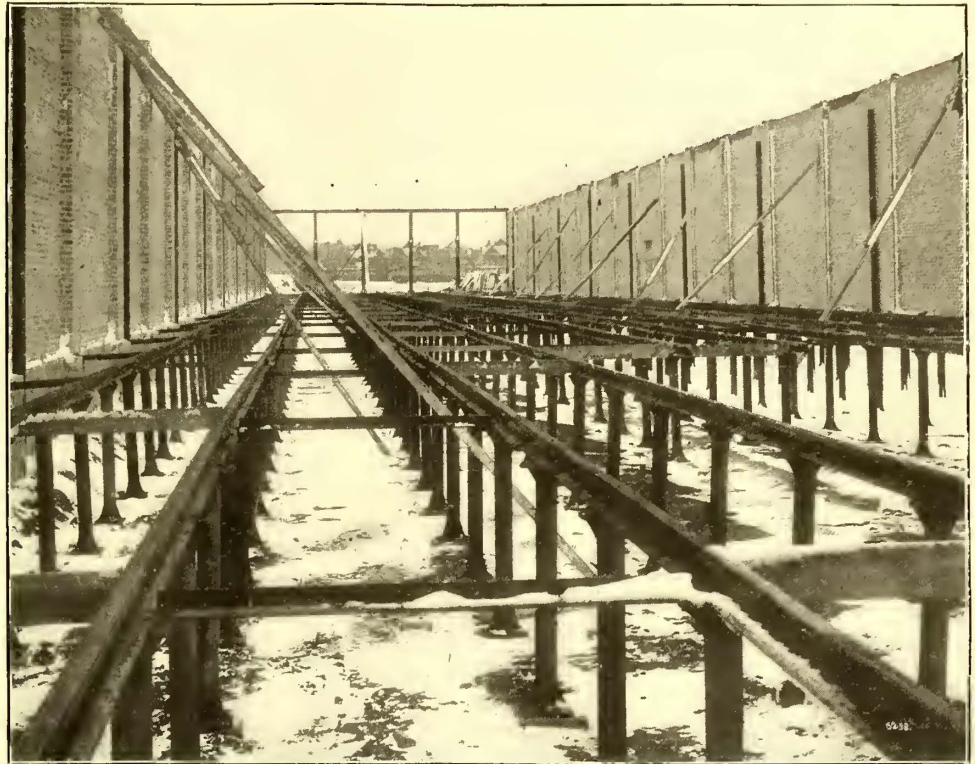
BEFORE LAYING CONCRETE FLOOR
